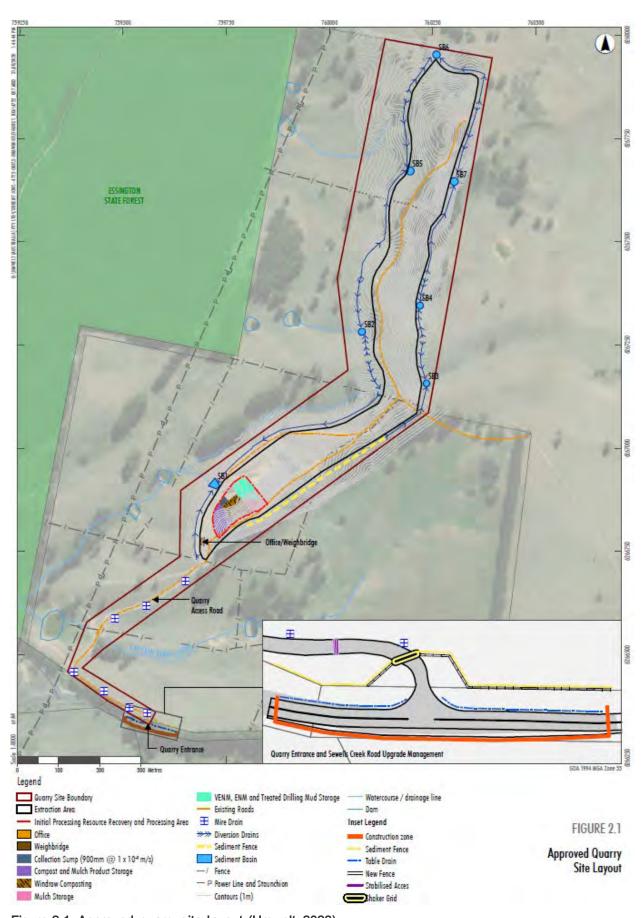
Approved quarry site layout (Umwelt, 2022)
